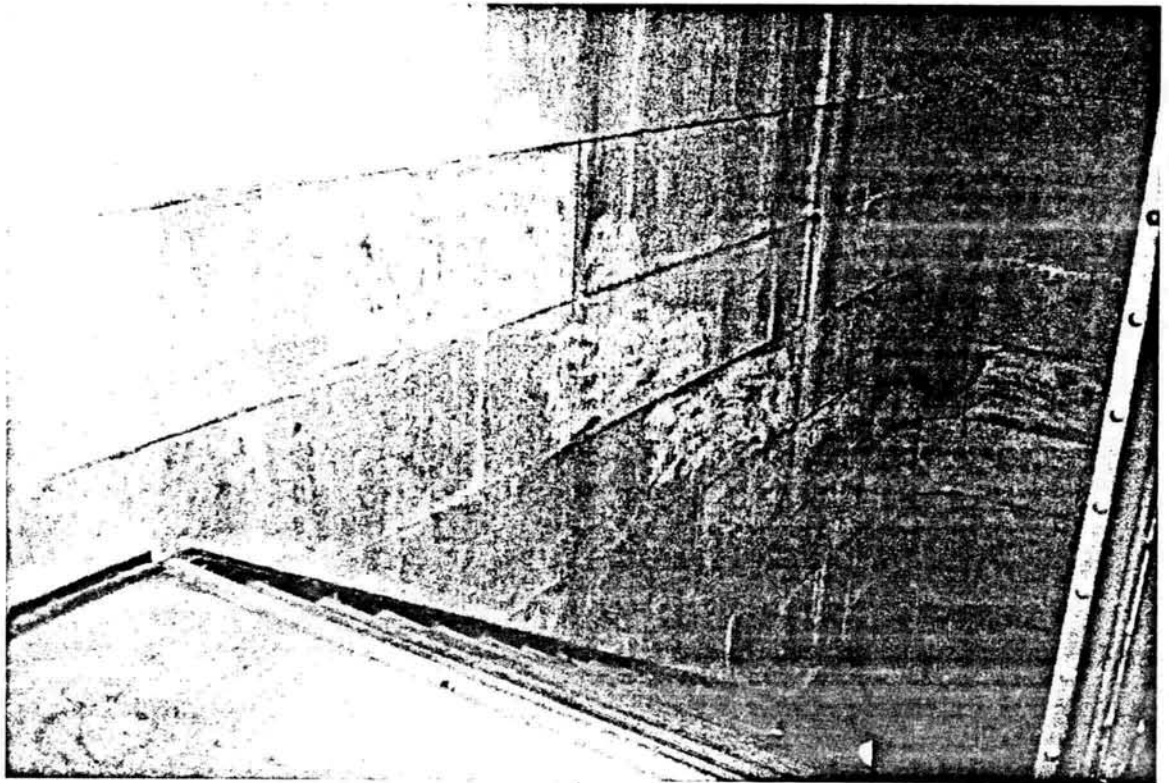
Interior view of west wall of the Monument looking down from the 460' landing. Random scrubbing of the stone has defaced the walls. The angle at the stair stringer is corroded.
